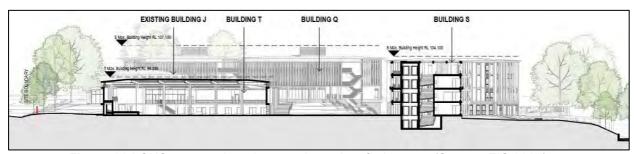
| CHS proposed north to south section, facing east (Source: EIS 2020)
